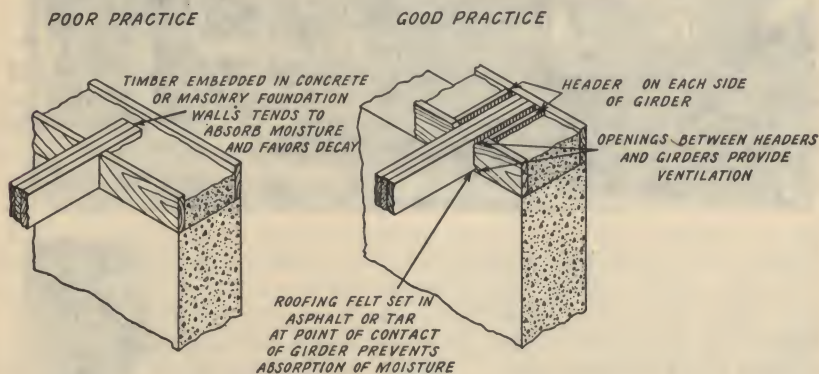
Good and poor practice with girders embedded in concrete or masonry.
